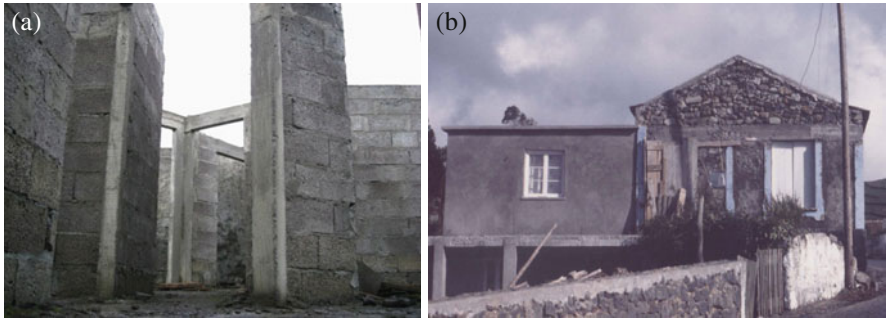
Construction solutions: a confined walls; b reinforced concrete structure with block masonry infills
